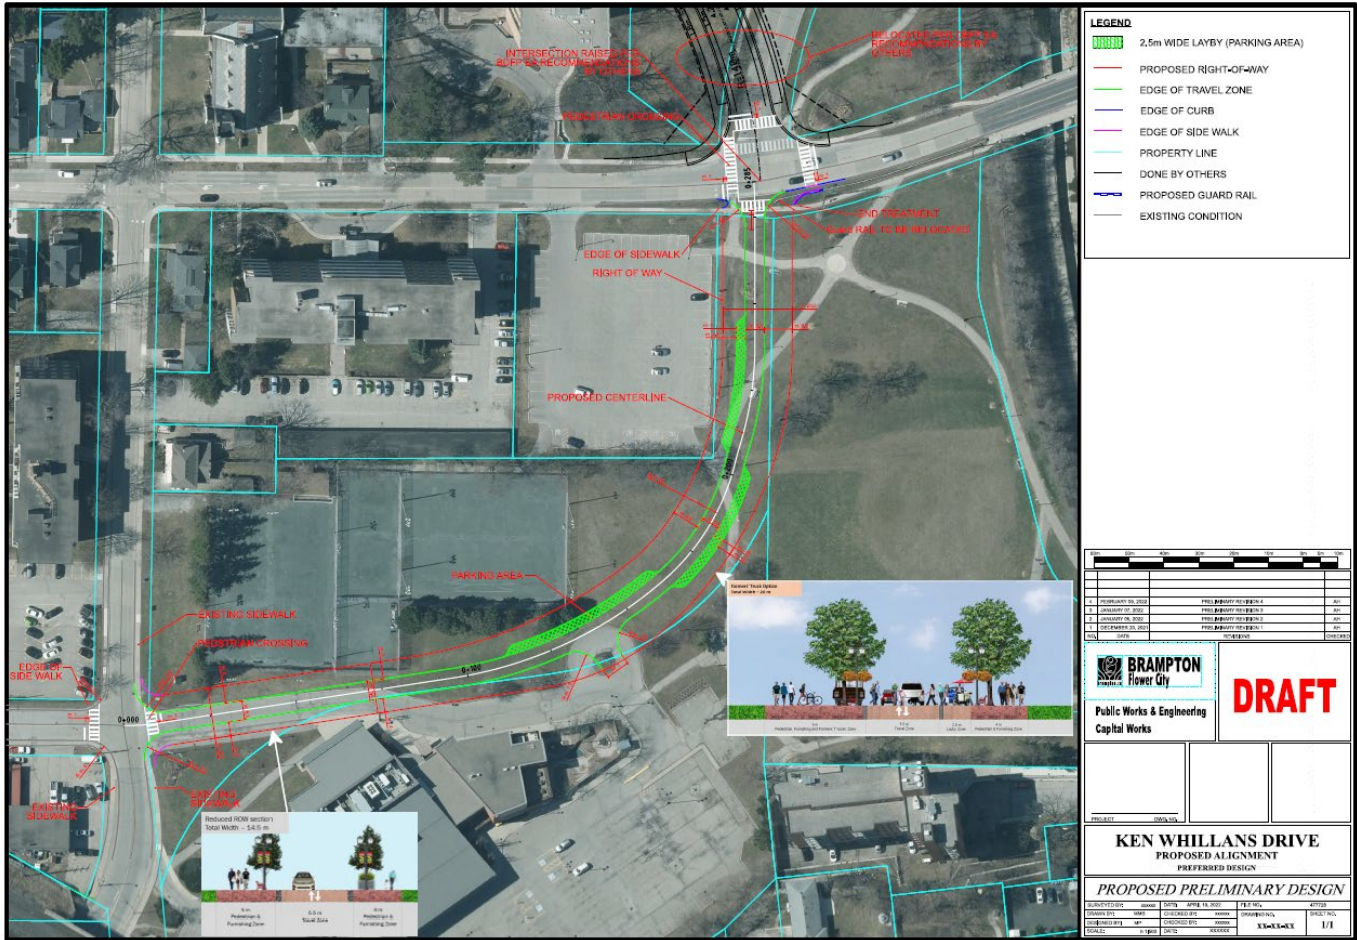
PRELIMINARY DESIGN PLAN FOR THE KEN WHILLANS DRIVE EXTENSION
